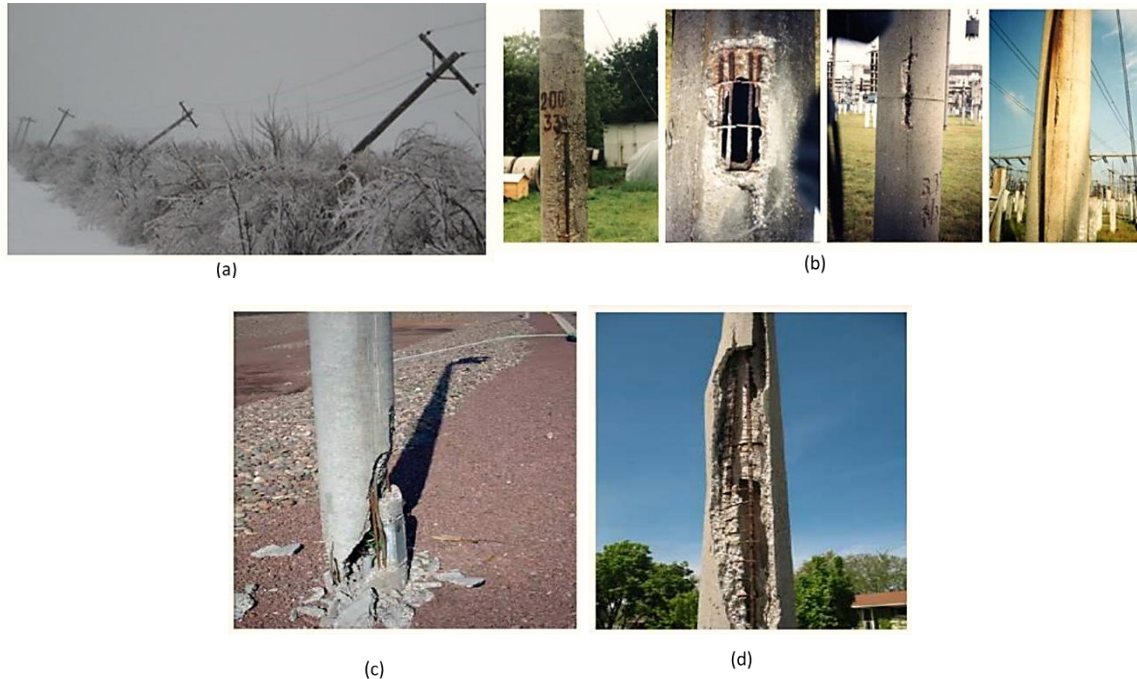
Electric concrete pole failure (a) damage of concrete poles under instantaneous severe wind and snow loads [16], (b) damages in RC supports of overhead power distribution lines [52]. (c) Shear damage of concrete pole due to a vehicle impact [54]. (d) Longitudinal cracking, corrosion of reinforcement, and spalling of concrete caused by differential shrinkage and segregation [56]
